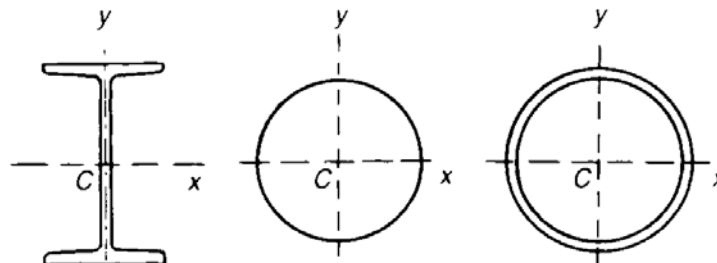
(a) I -section beam. (b) Solid circular cross-section. (c) Hollow circular cross-section.
